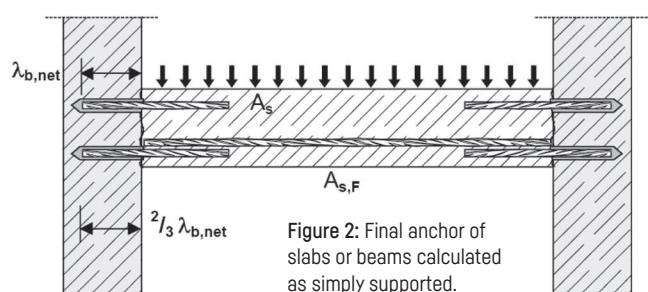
Final anchor of slabs or beams calculated as simply supported.
